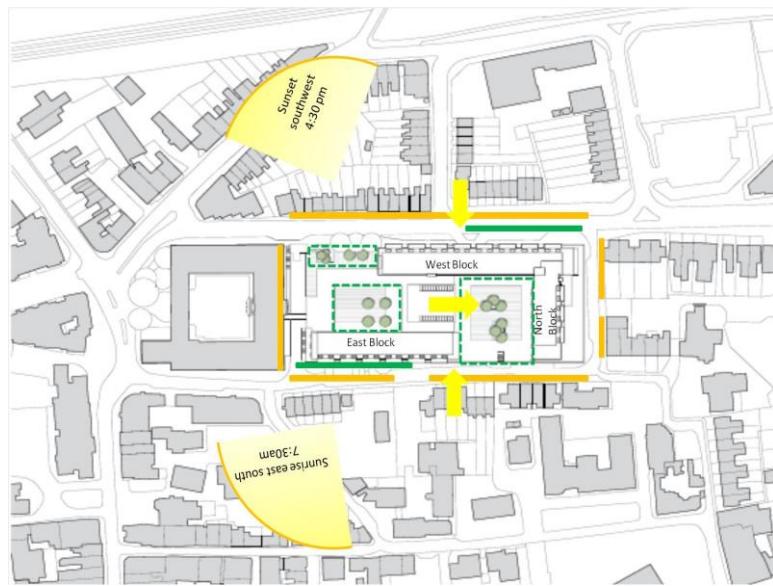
Site plan of the Elizabeth II Courts, mapping of the building orientation to the sun, direction of the sun around the building and of the surroundings.
